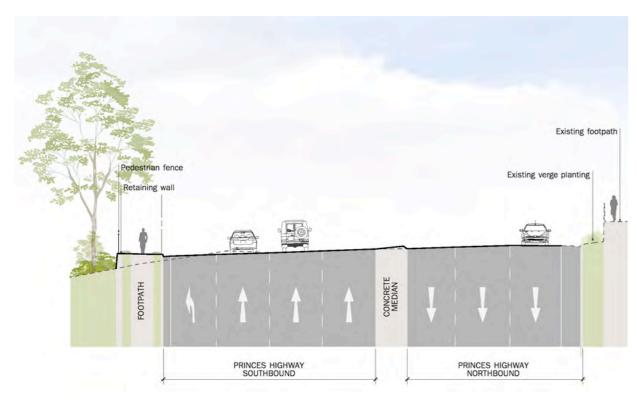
Section 1 through the Princes Highway - Chainage 76780 (Scale 1:250)
